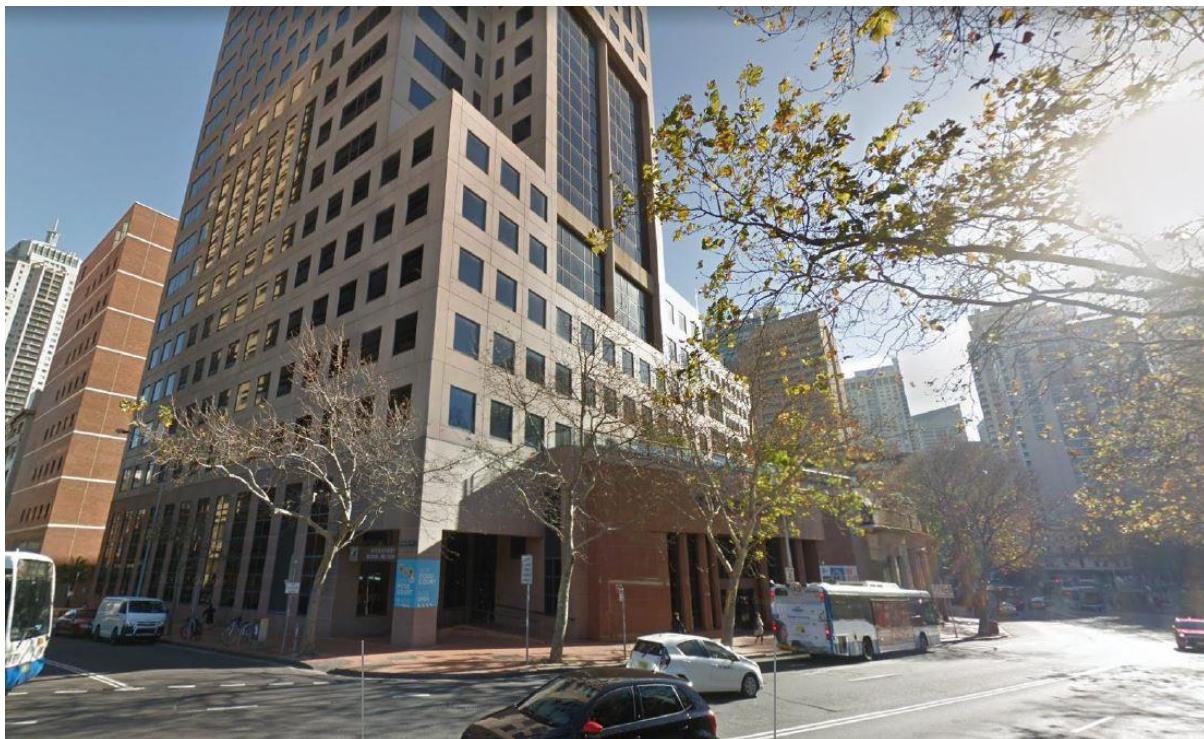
Site viewed from corner of intersection of Pitt Street and Barlow Street - existing
